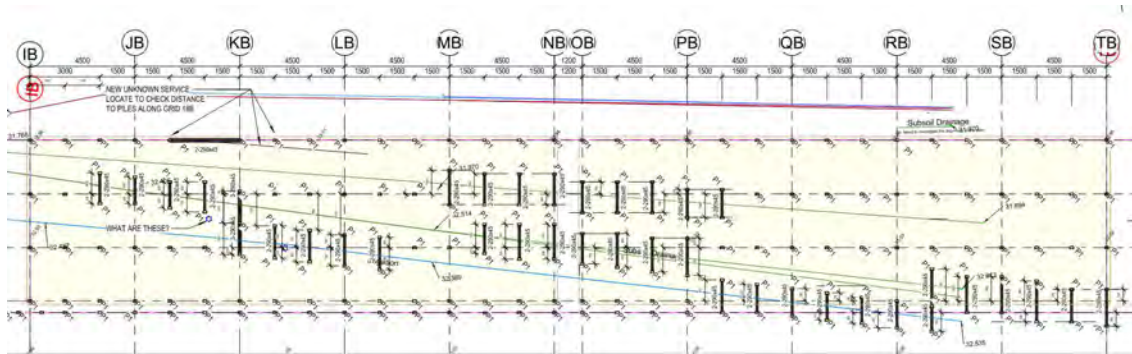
Example of extensive pile bridging required at one site to avoid existing underground services
